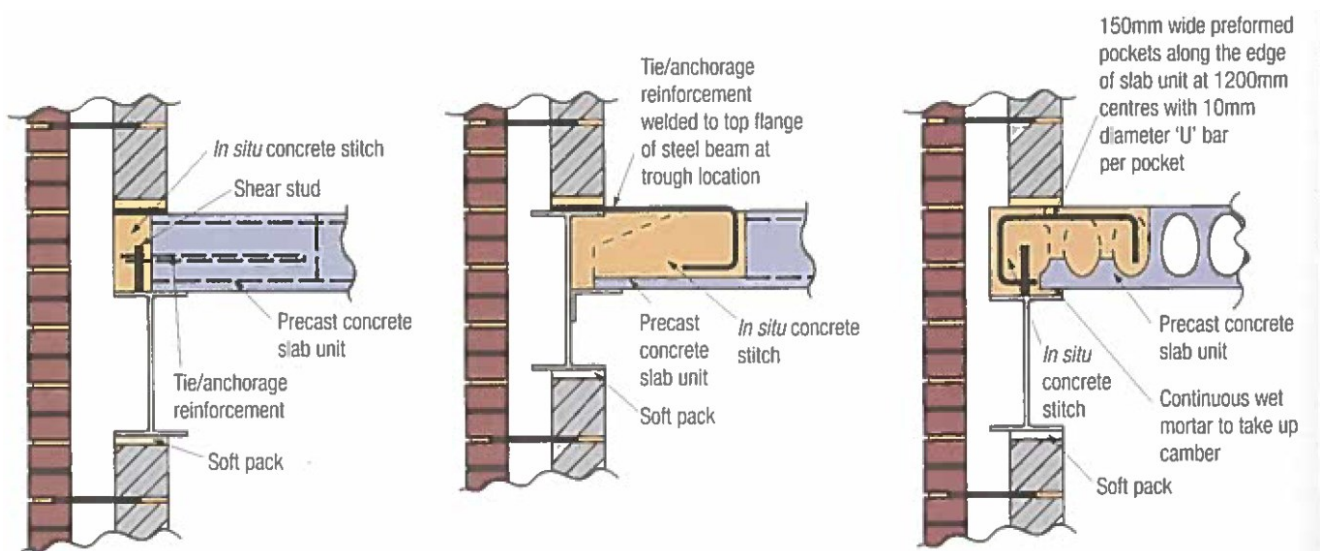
Anchorage of precast units to external steelwork by ties (The Institute of Structural Engineers, 2010)
